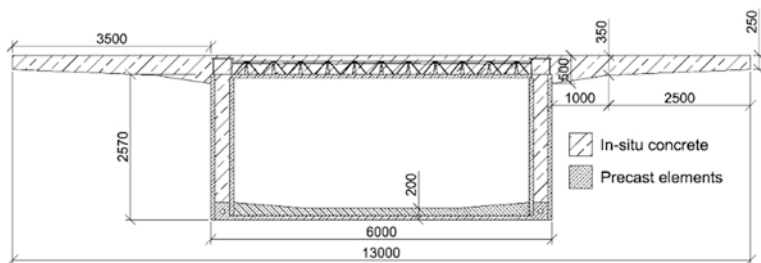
Cross section of the bridge girder out of hollow wall elements and ultra-thin precast elements
